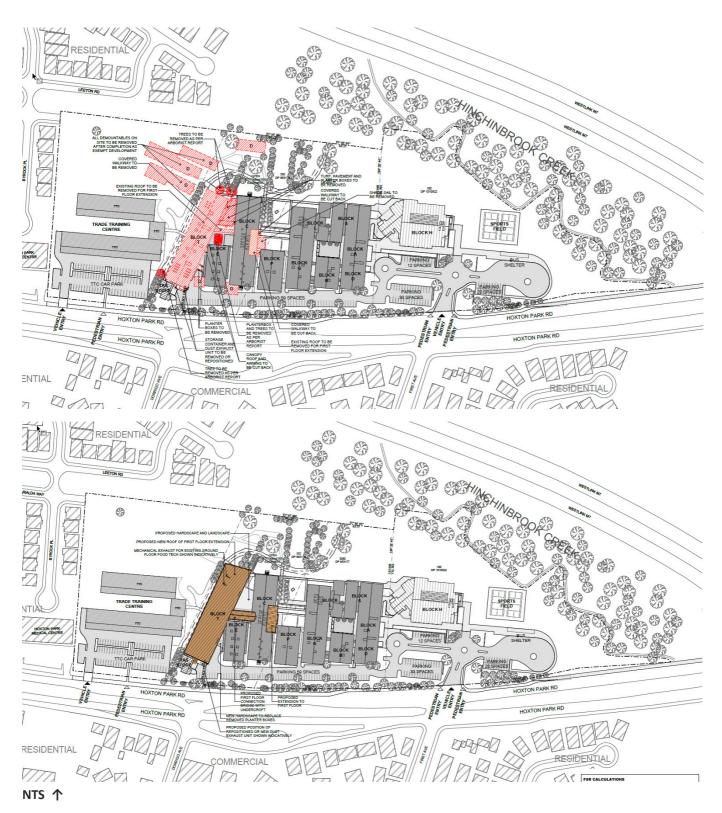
Proposed site and demolition plans (Source: JDH Architects)
